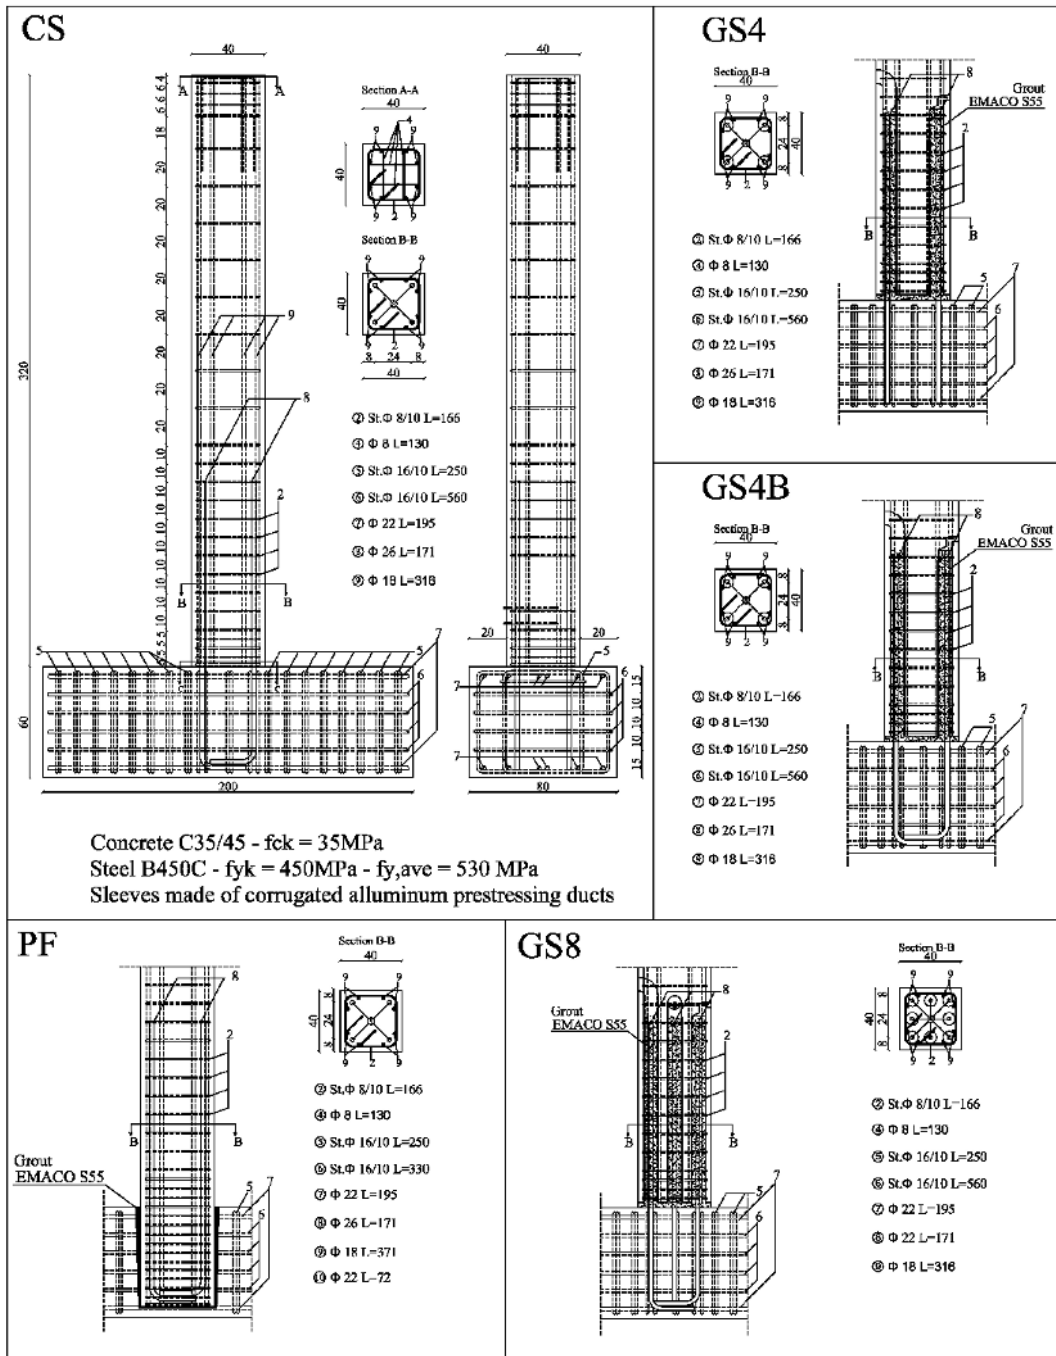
Tested specimens (Dimensions expressed in cm): (a) CS, cast in situ column; (b) GS4, column with four grouted sleeves; (c) GS4B, column with four grouted sleeves and 90° hooks in the anchored bars; (d) PF, pocket foundation; (e) GS8, column with eight grouted sleeves.
